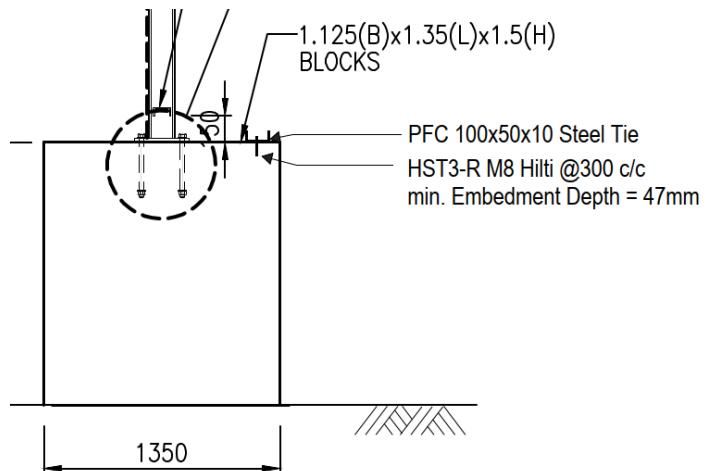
Details of RP Footing Interlocked by the PFC Steel Tie
